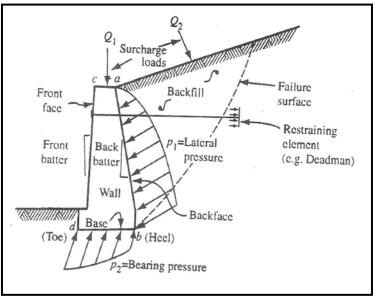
, Retaining Wall Schematic (Earth Retaining Structures – June 2008)
